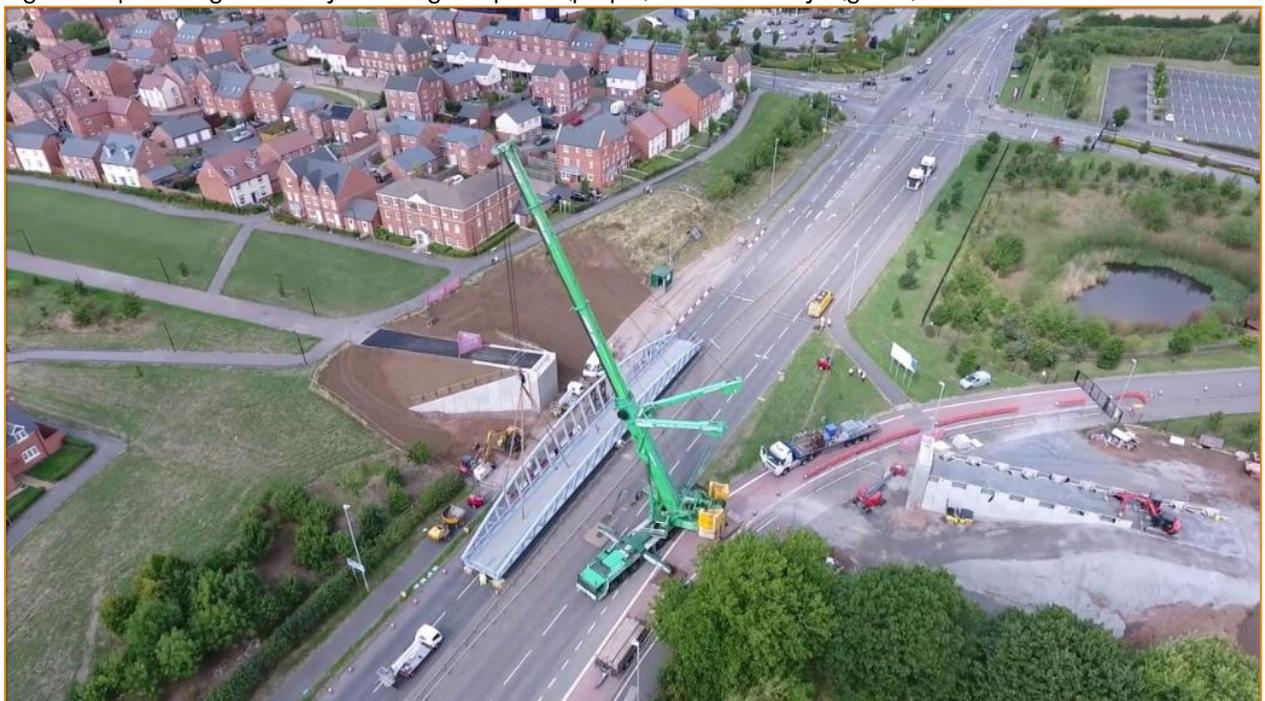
new Birstall footbridge being lifted in to place in August 2018
